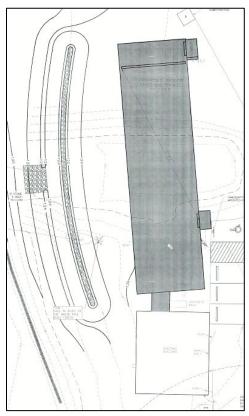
Snippet of the approved site plan from SPR-01-13, Mod. 2 showing the original approved location of the level spreader to the immediate west of the clubhouse and indoor shooting range.
